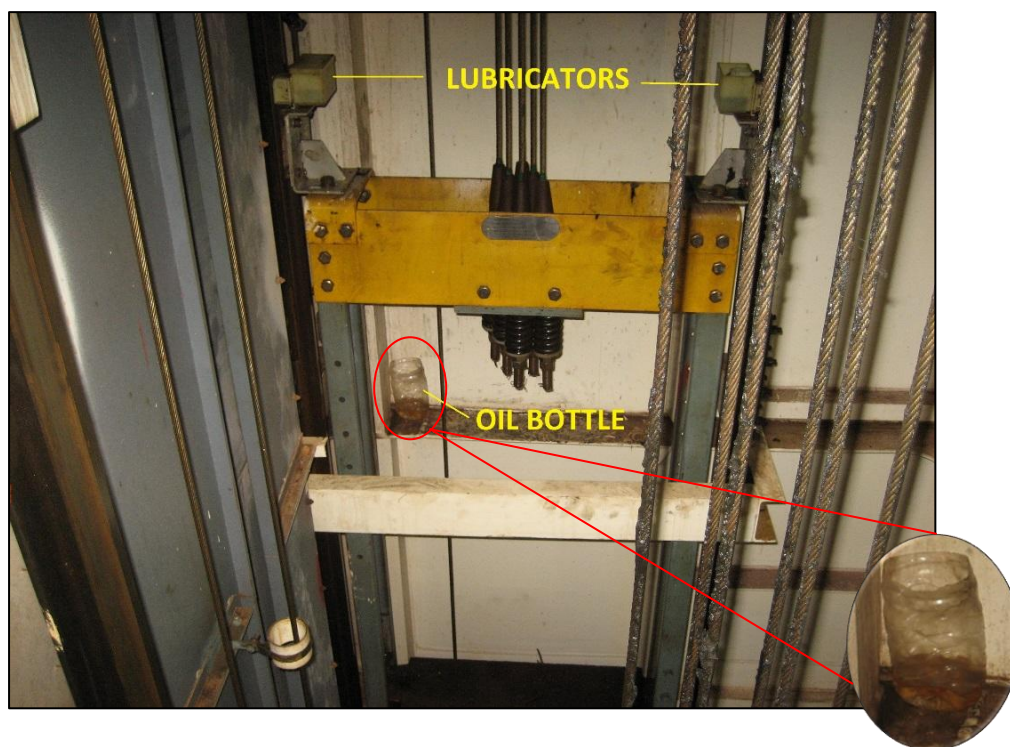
Position of lubricators and plastic oil bottle left in the elevator shaft
